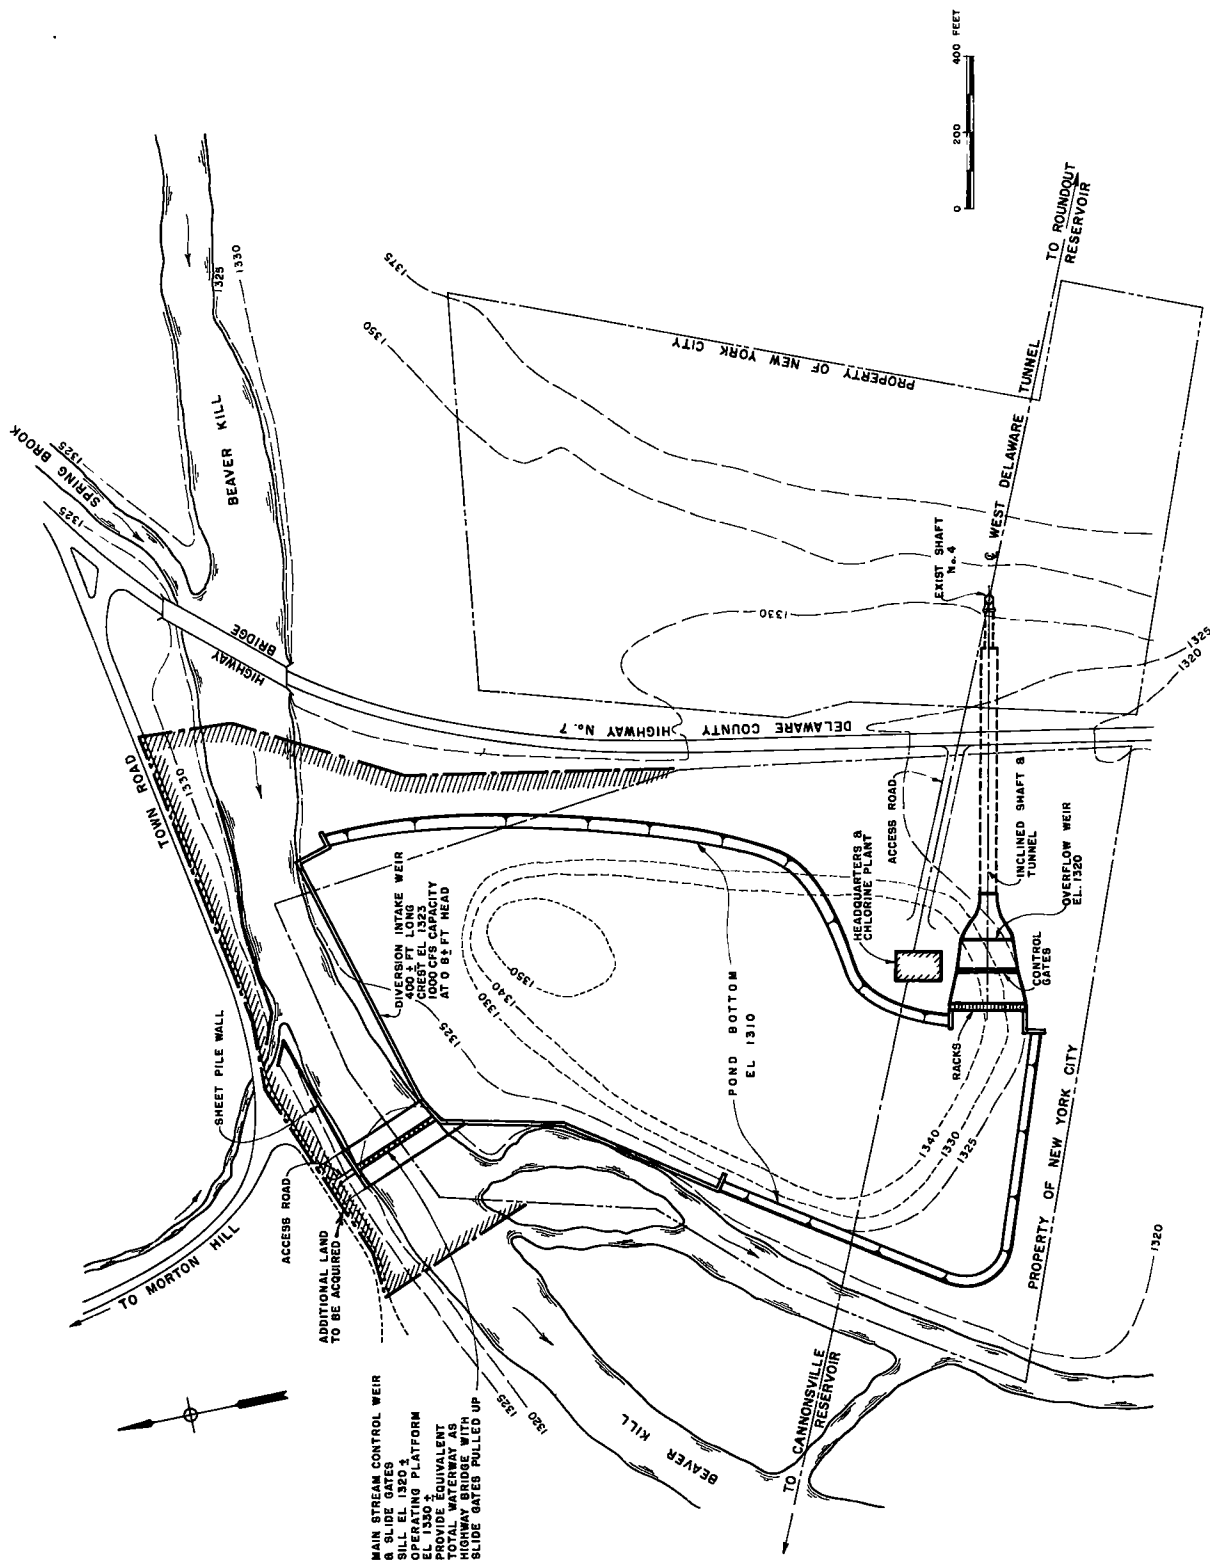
BEAVER KILL FLOOD SKIMMING PROJECT - PLAN
